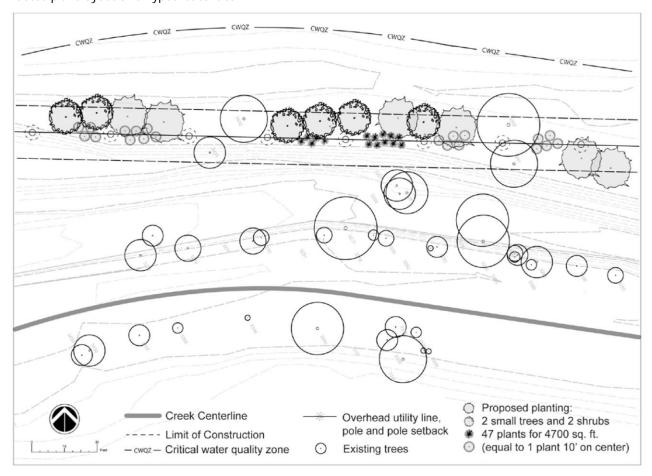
S.5-1: Example of Rooted Plant Layout and Calculation
